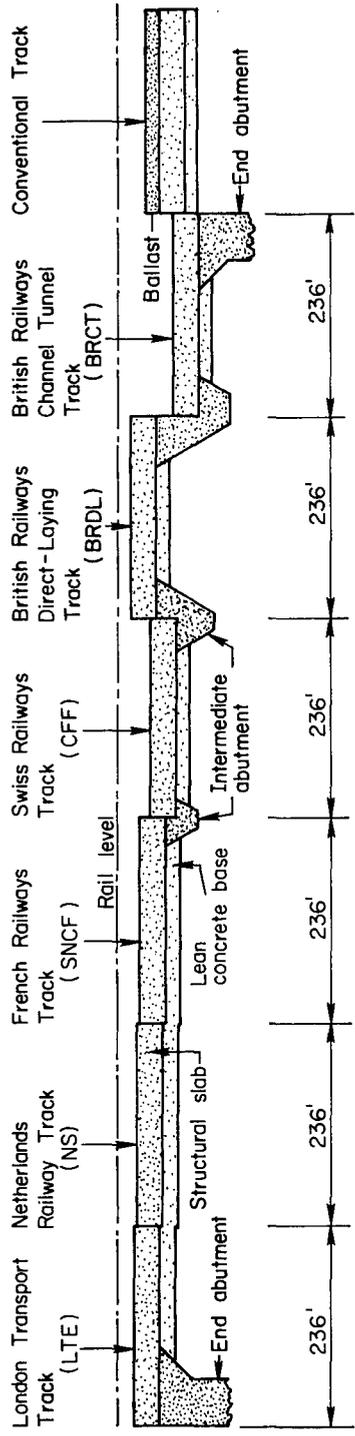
LAYOUT OF SLAB TRACK SECTIONS AT RADCLIFFE-ON-TRENT
